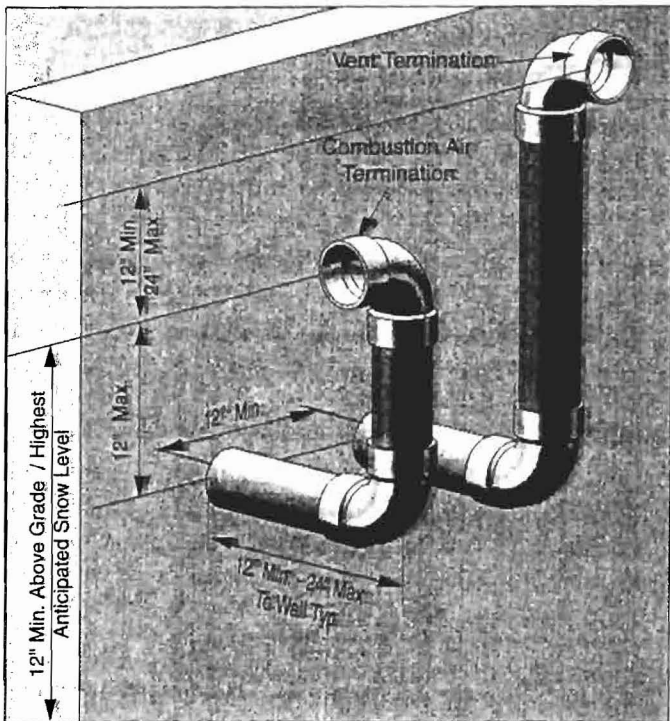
Direct Vent - Sidewall Snorkel Termination of Vent and Combustion Air Piping
